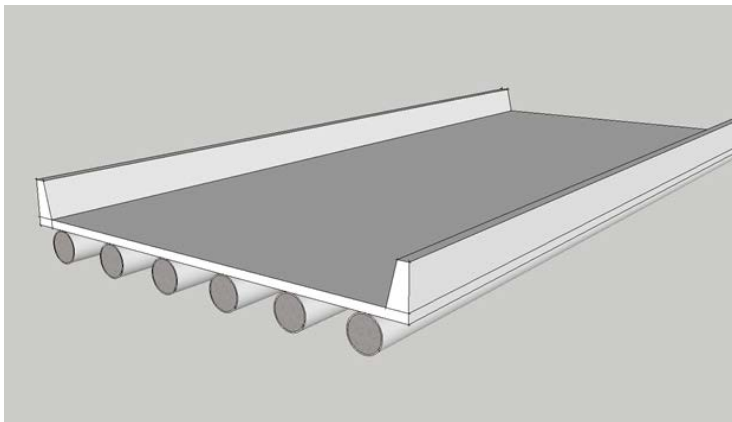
Conceptual design for concrete-filled FRP tube (CFFT) girder bridge.
